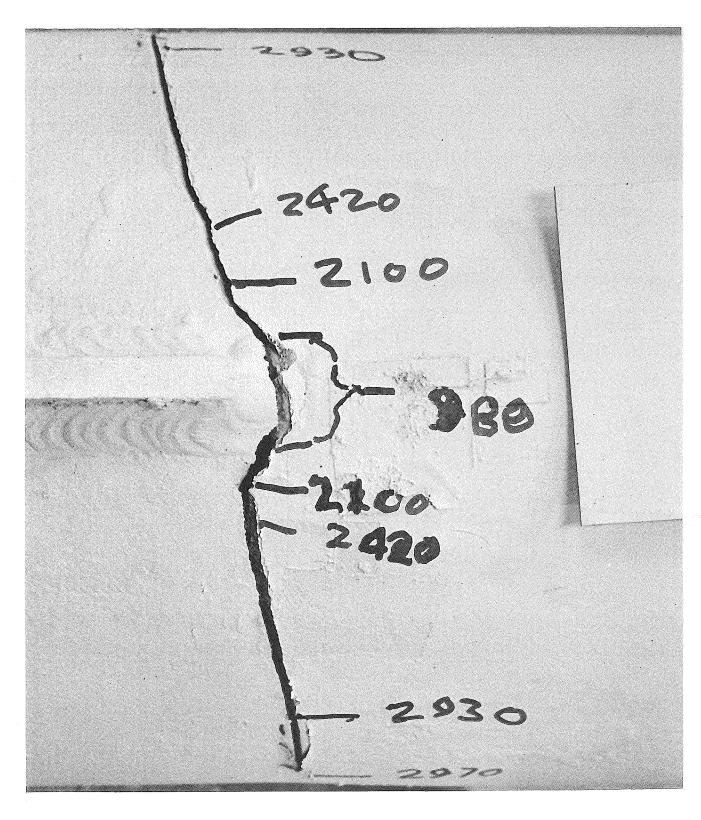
JOINT TYPE 3-SPECIMEN No. 5 (SCALLOPED GUSSET PLATE) DETAILED CRACK PROPAGATION IN DIAGONAL MEMBER
